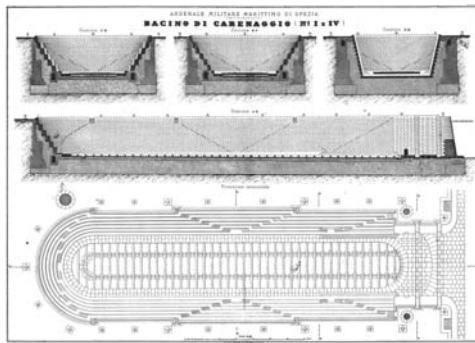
Dry-docks 1-4(Archivio Storico del Muggiano - Fondazione Fincantieri)
